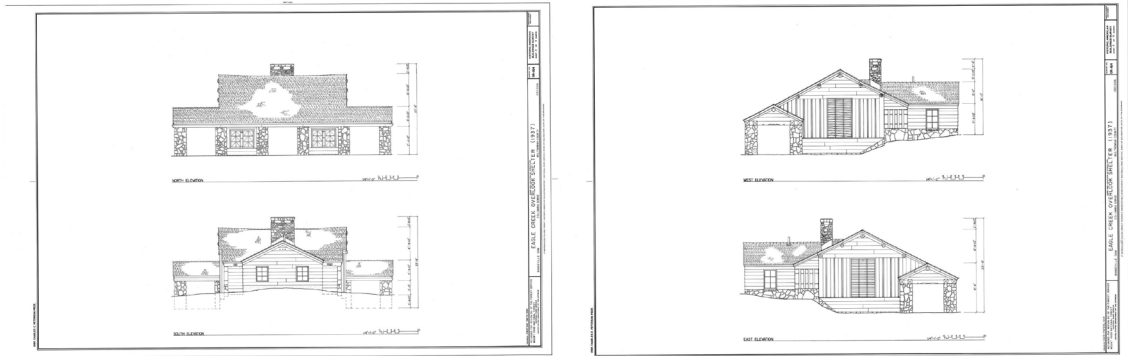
HABS drawing of Eagle Creek Overlook Shelter, 1937, made in CAD. It indicates the use of custom material pattern on the roof and wall in elevations, avoiding “predefined hatch” from the software (Historic Preservation Northwest, 2015)
